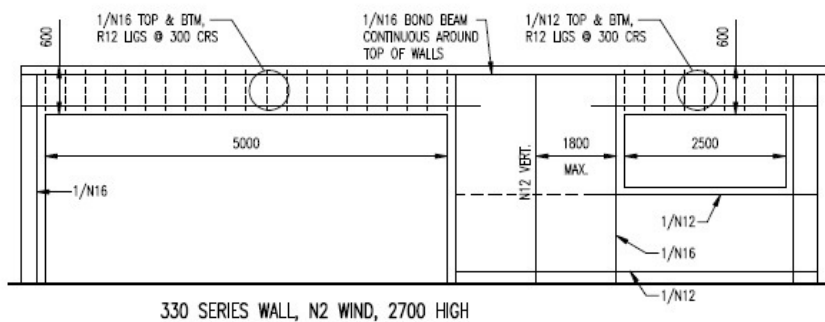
2700 High Wall, N2 Wind Rating, 330 Series ECO-Block (Max. roof load width: 10.0m)
